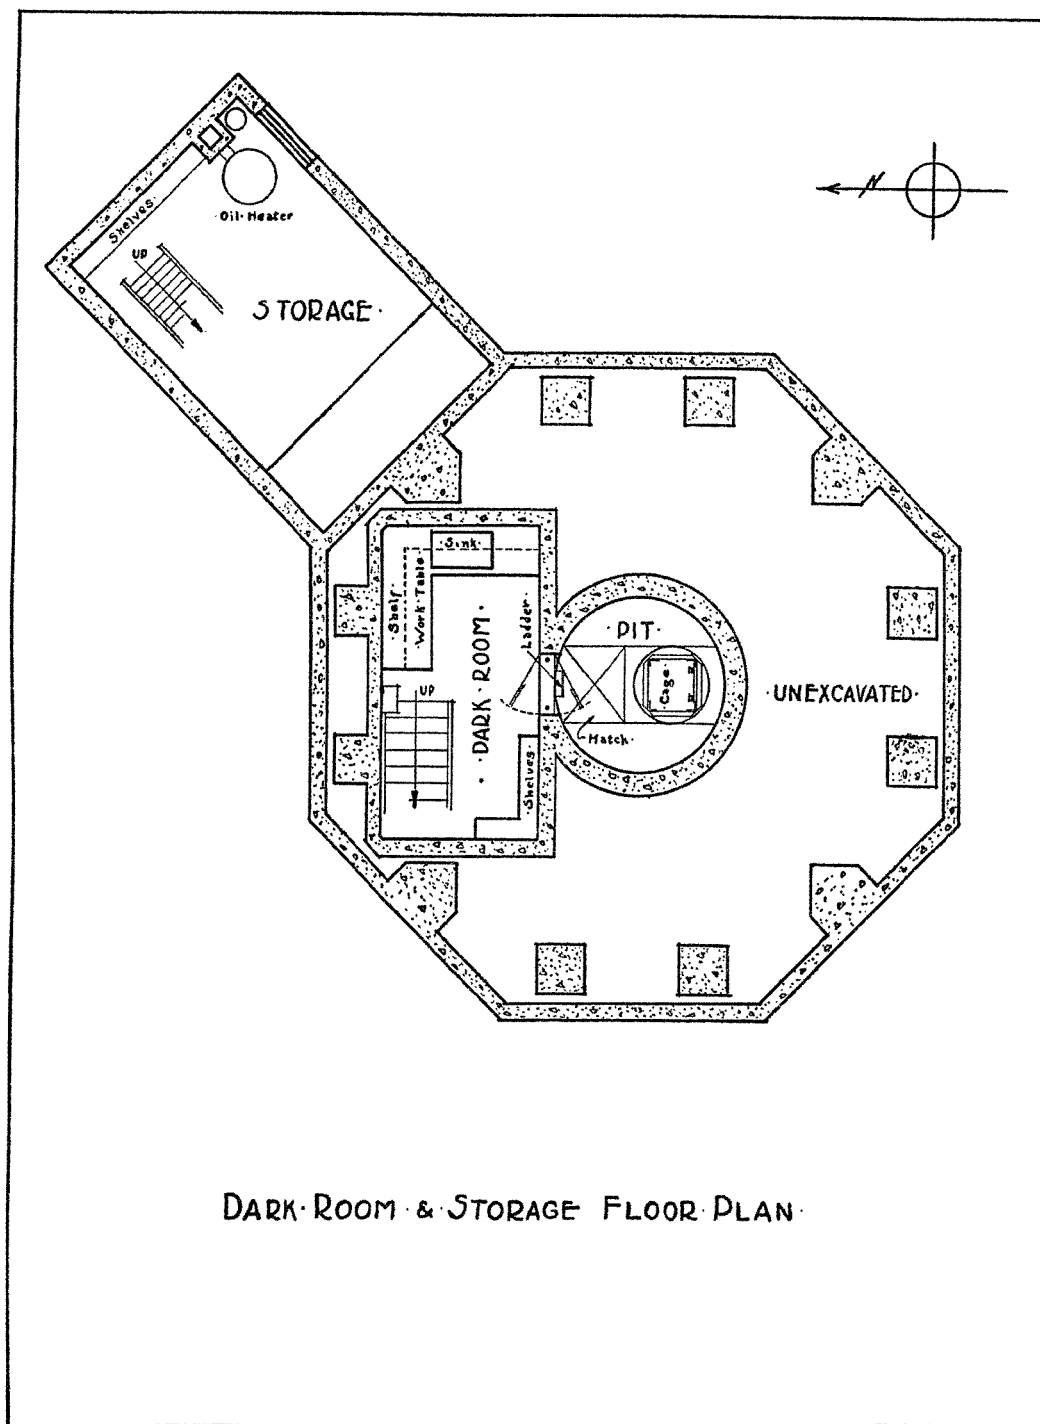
The Tower Telescope; Dark Room and Storage Floor Plan.
